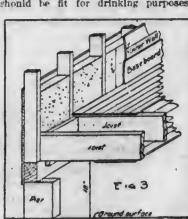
Buildings Supported on Piers Are Ratproofed by Raising Above Ground Level and Placing Concrete Between Walls Abovs Silia.
